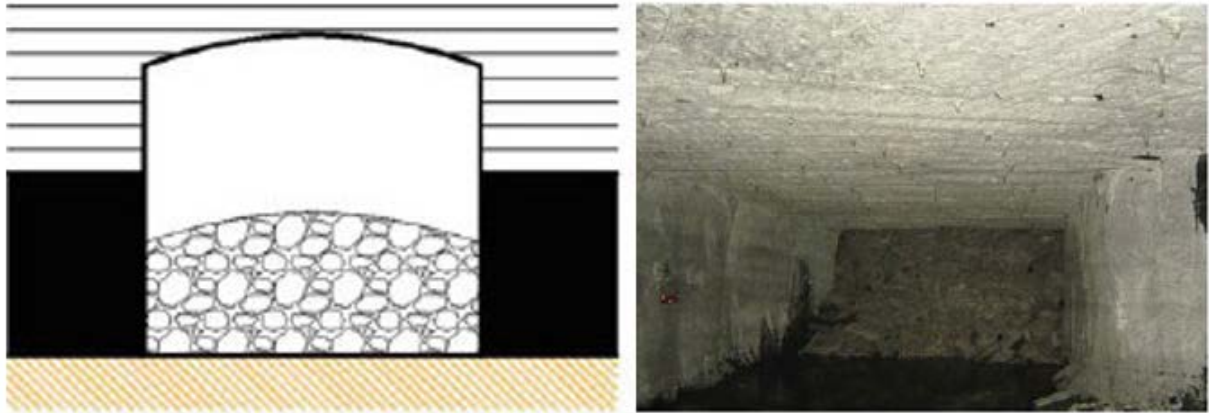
(a) Abutment shear under gravity or dead weight; (b) roof fall at intersection due to abutment shear (Galvin, 2016).
